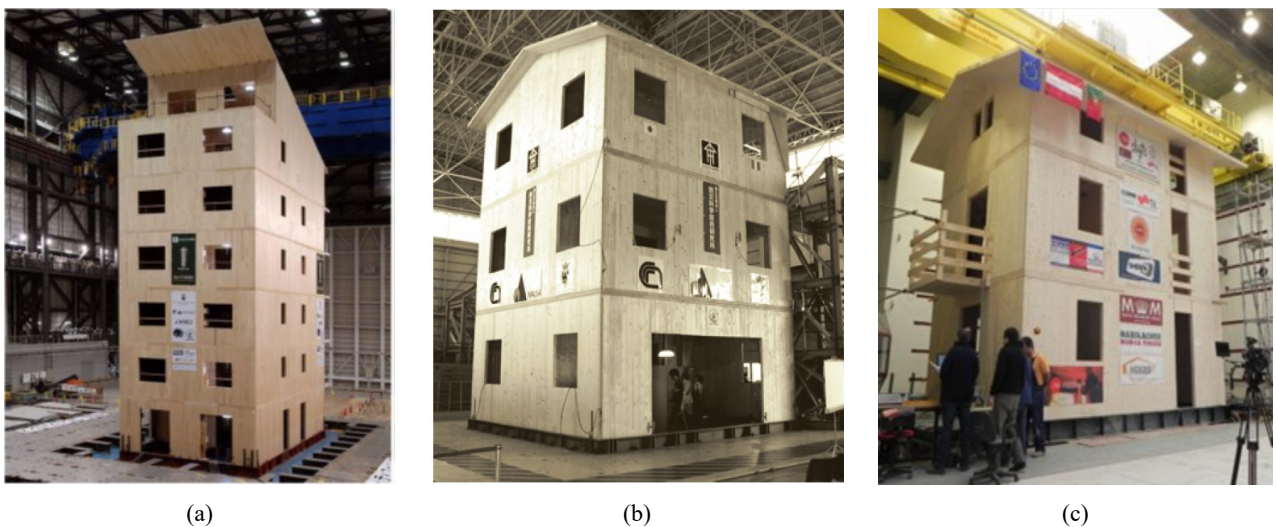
Shake-table tests: (a)(b) SOFIE project [2.14][2.17] and (c) Timber Buildings project [2.26].
